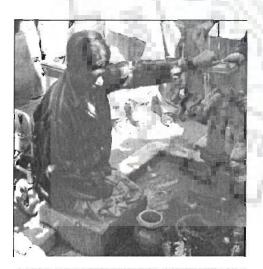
Low concrete sitting platform to access hand pump Source: Jones, H E, et al (2002)
